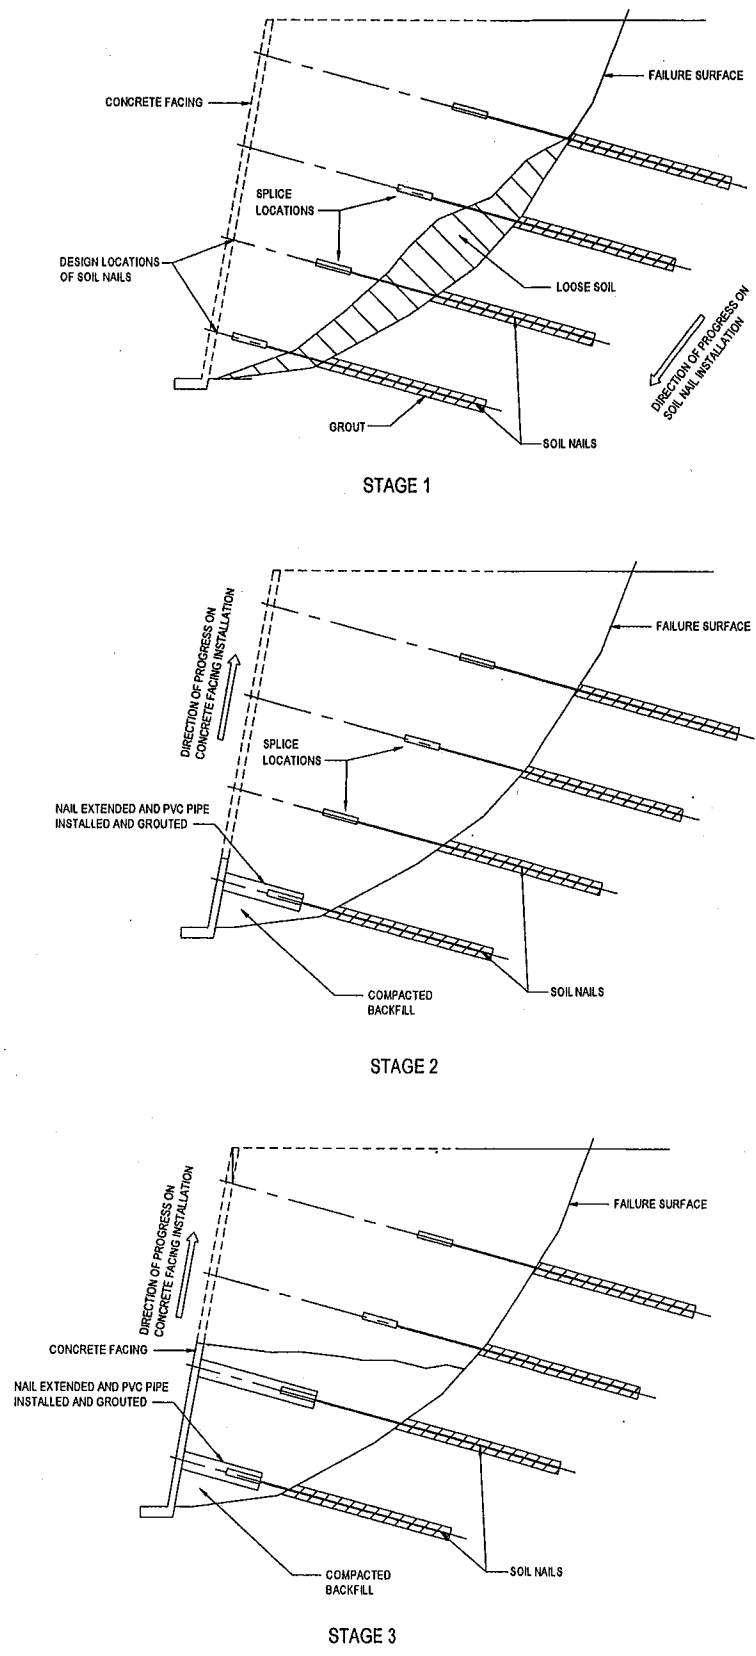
Construction sequence for cast-in-place concrete wall and nail extensions
